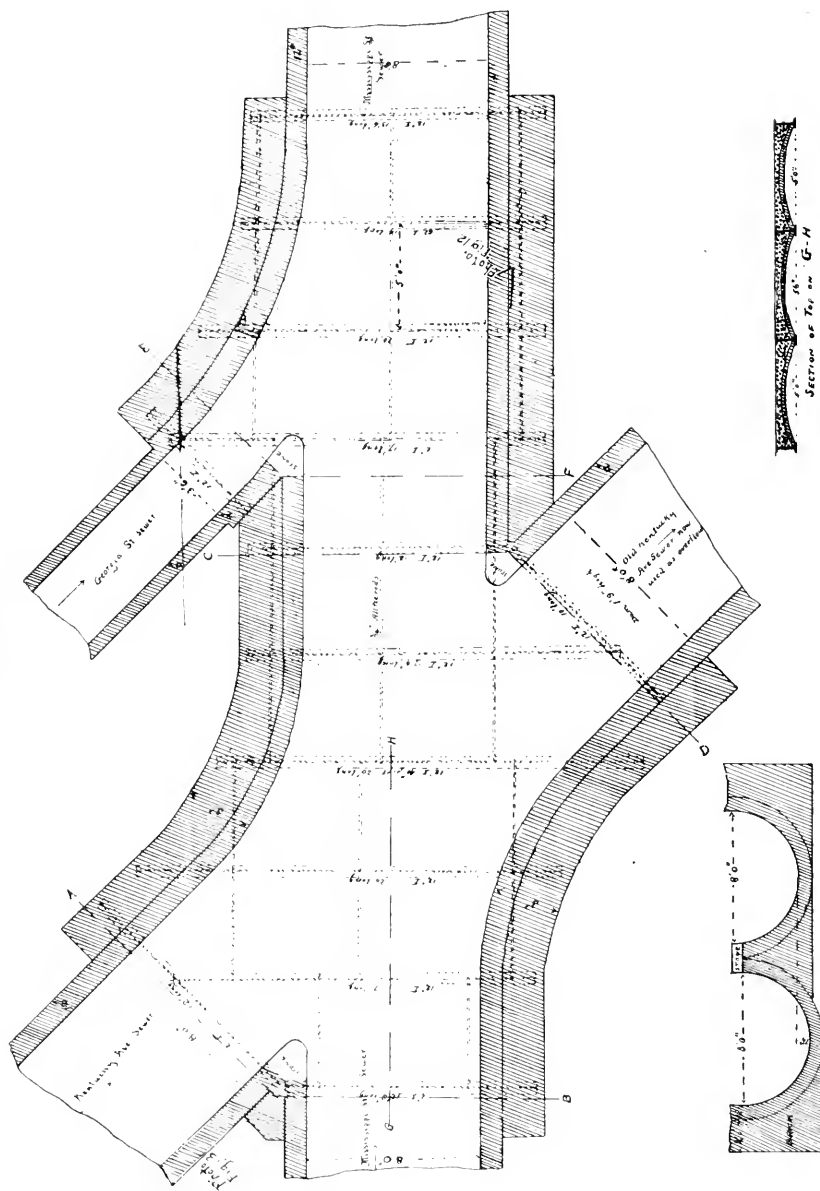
MISSISSIPPI STREET SEWER. Scale, 1 inch = 9 feet.
